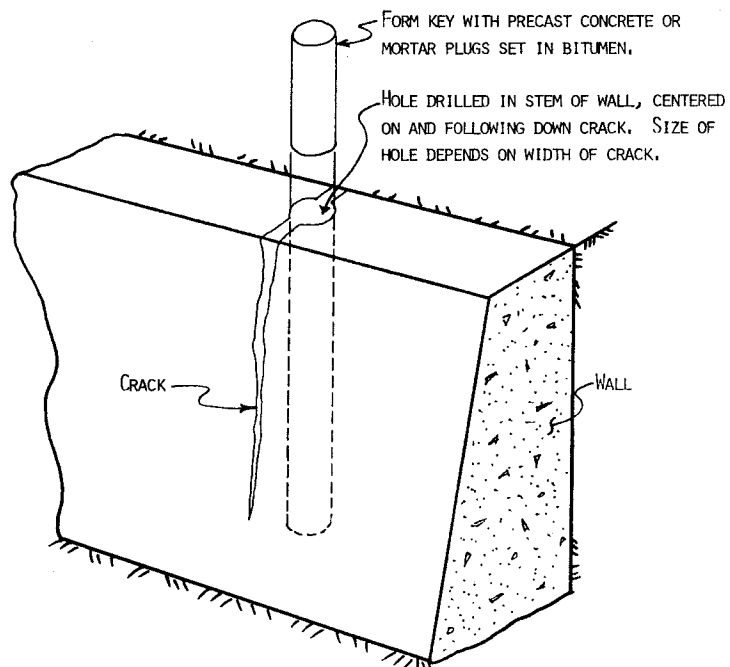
Repair of crack by drilling and plugging (ACI Committee 224, 1984).
